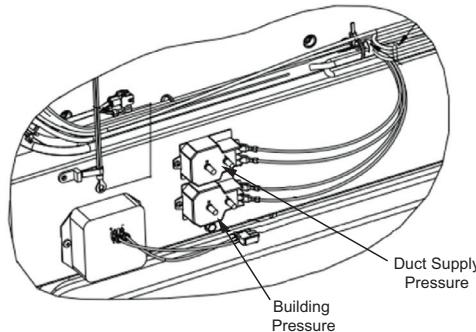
Pressure Transducer Layout (Cover Removed)
